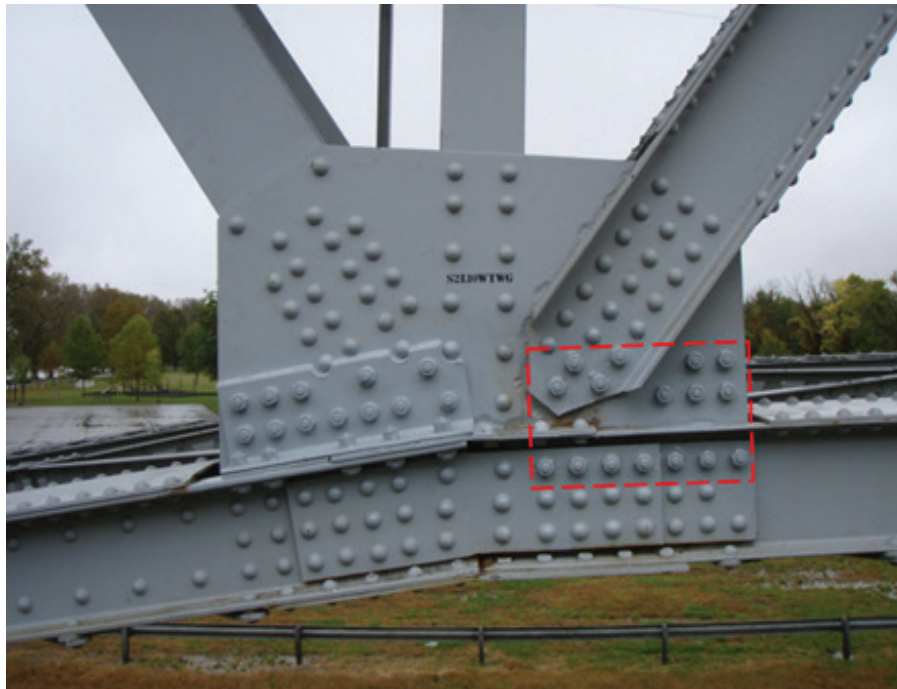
Installation of an angle element (left side of gusset) and a plate element (dashed red line on right side of gusset represents plate installed on inside face of gusset) to address section loss on a horizontal shear plane
